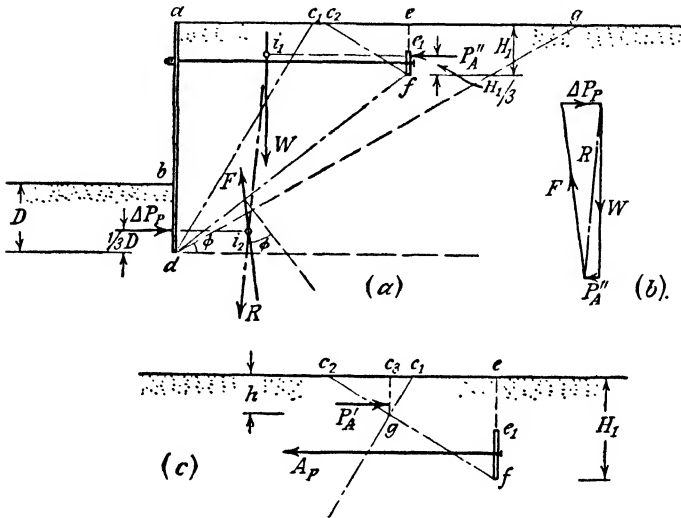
(a and b) Conditions for equilibrium of bulkhead anchored to a wall located above the line  $dg$ , which represents natural slope of sand; (c) conditions for equilibrium of anchor wall, if surface of sliding passing through lower edge of anchor wall intersects surface of sliding through lower edge of bulkhead.
